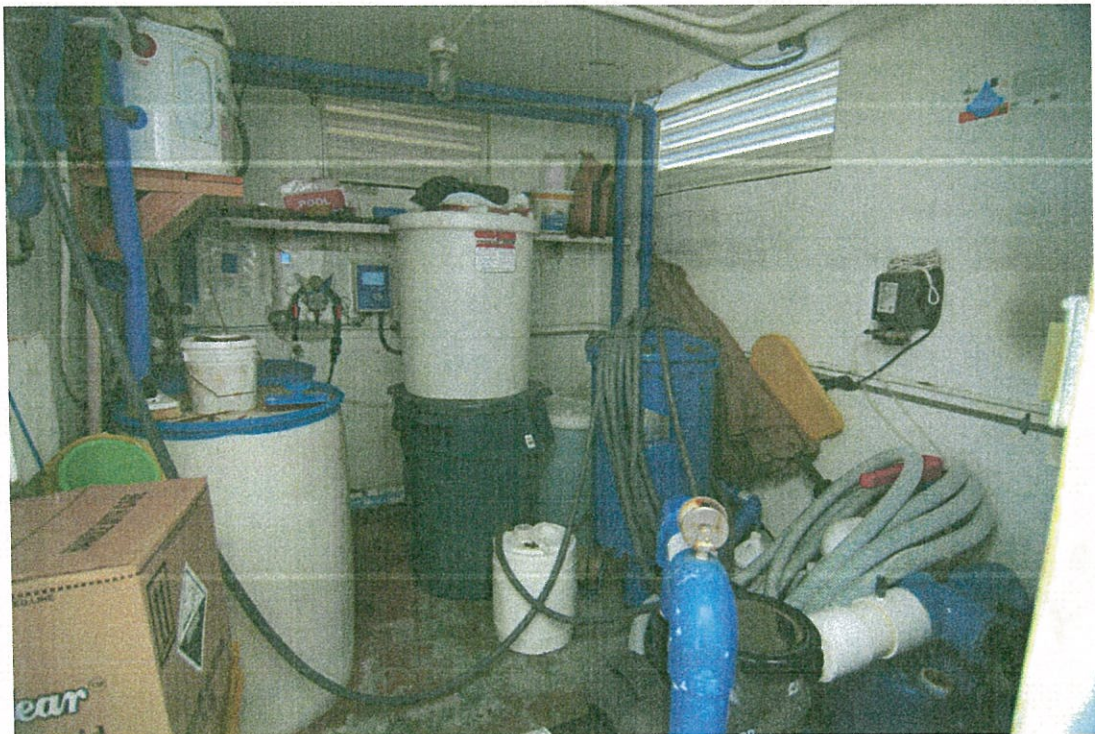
VIEW OF INTERIOR OF POOL EQUIPMENT BUILDING
